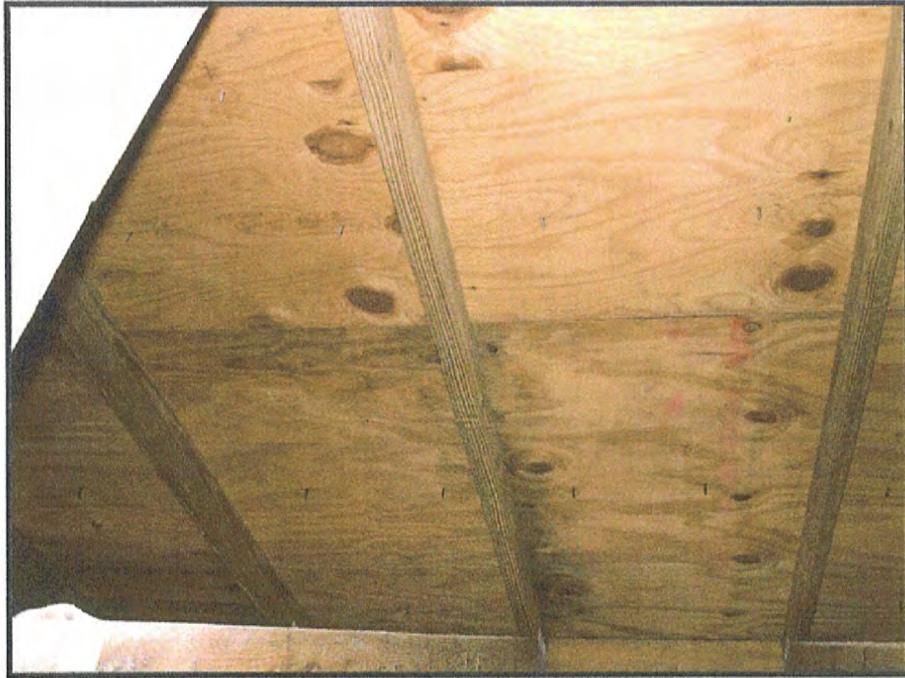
Typical condition of roof deck and prefabricated wood trusses.
